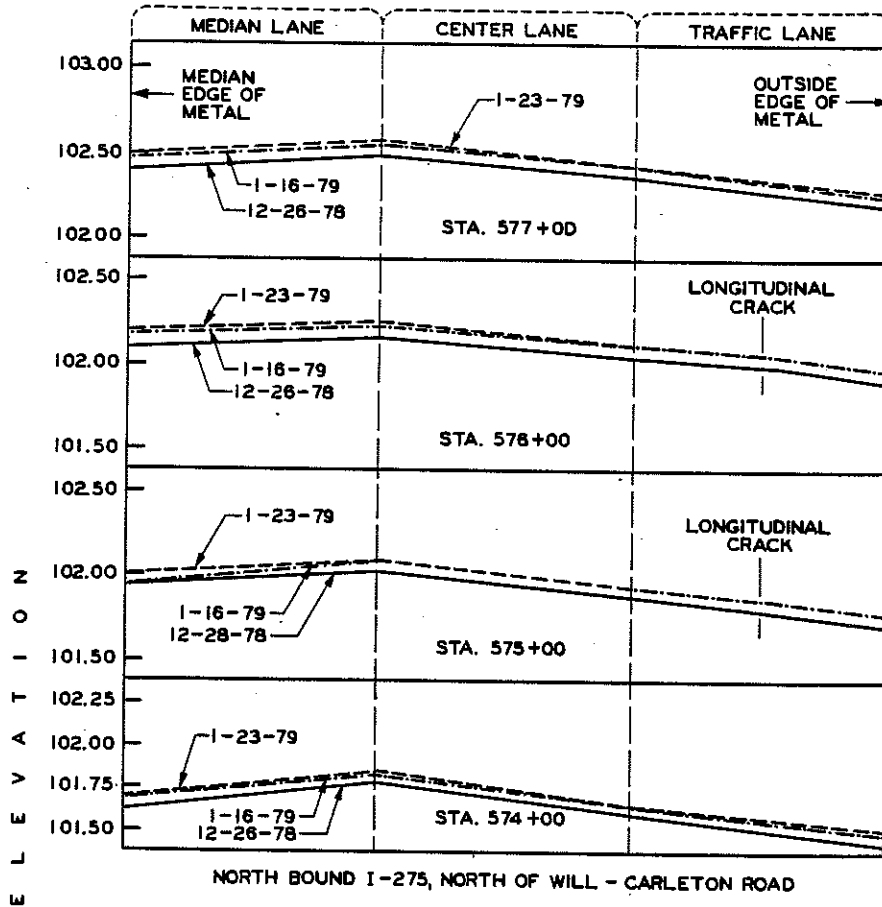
Transverse pavement profile at Sta. 577+00, 576+00, 575+00, 574+00 indicating no edge of metal tendency for the outside edge of metal to heave more than the rest of the pavement.
